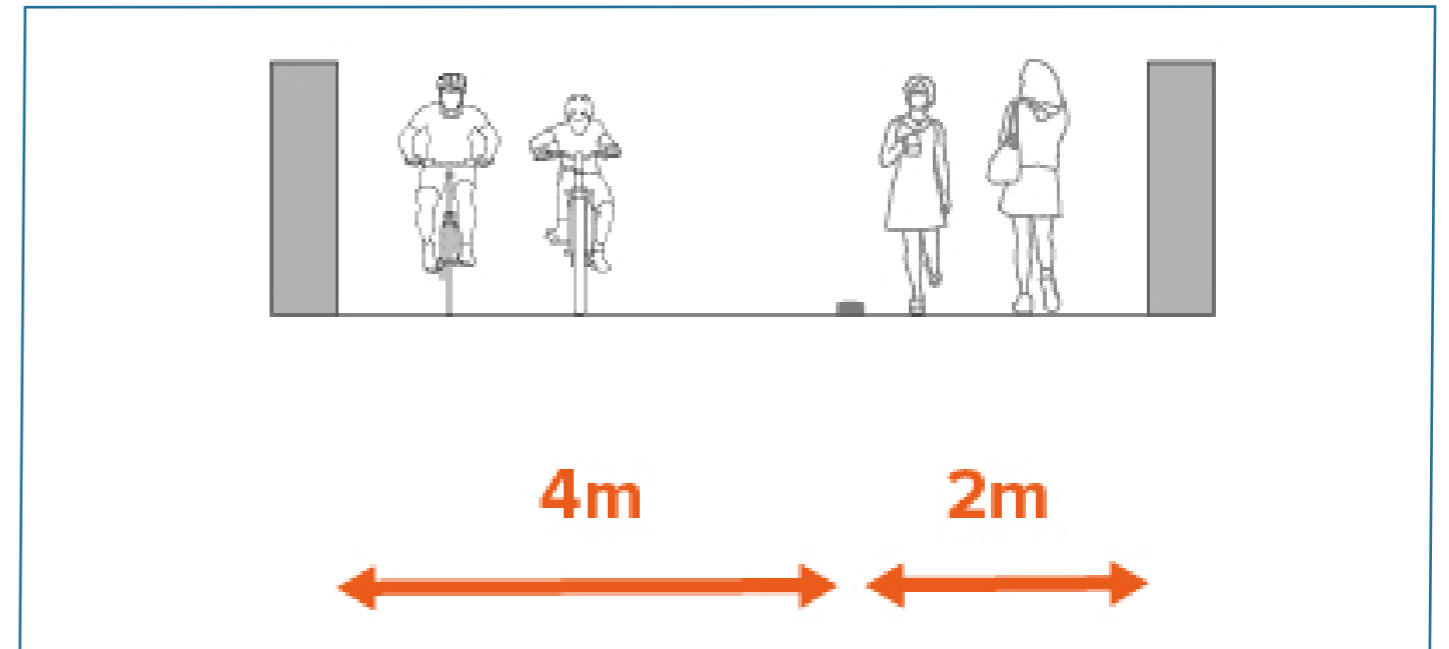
Proposed cross section of the pedestrian and cycle bridge
